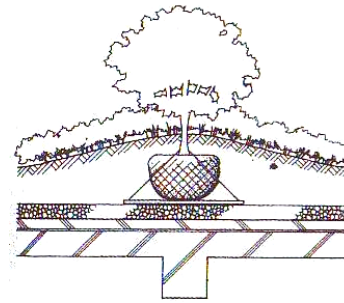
Mound for large plants for rooftop planting. Wong, Nyuk Hien and et al., (2002).
